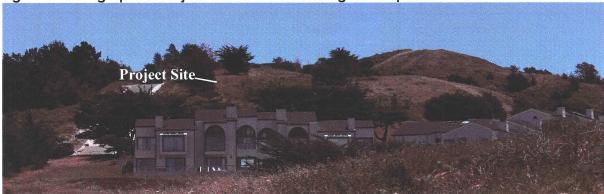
View looking southeast from off site (Source: M-Group, accessed on June 16, 2020)
